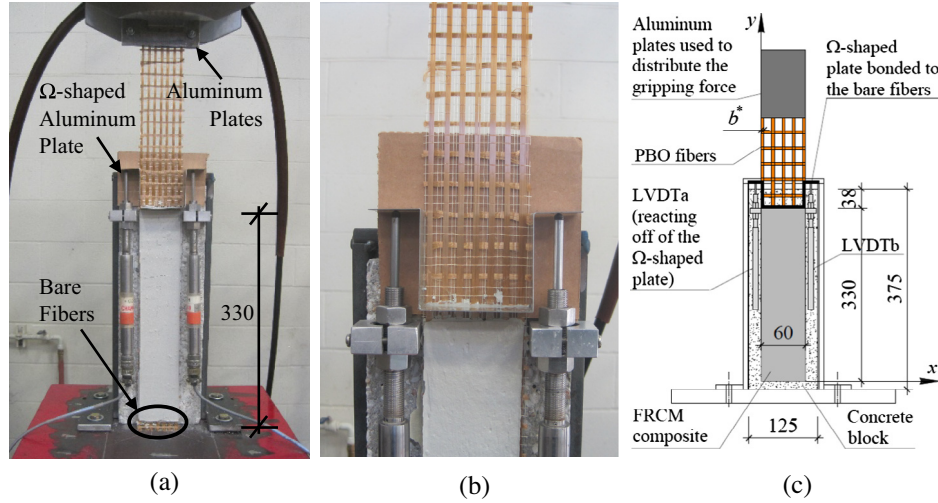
(a) Photo of specimen DS\_330\_60\_D\_2. (b) Detail of the Ω-shaped aluminum plate in specimen DS\_330\_60\_4. (c) Test set-up. (Dimensions in mm.)
